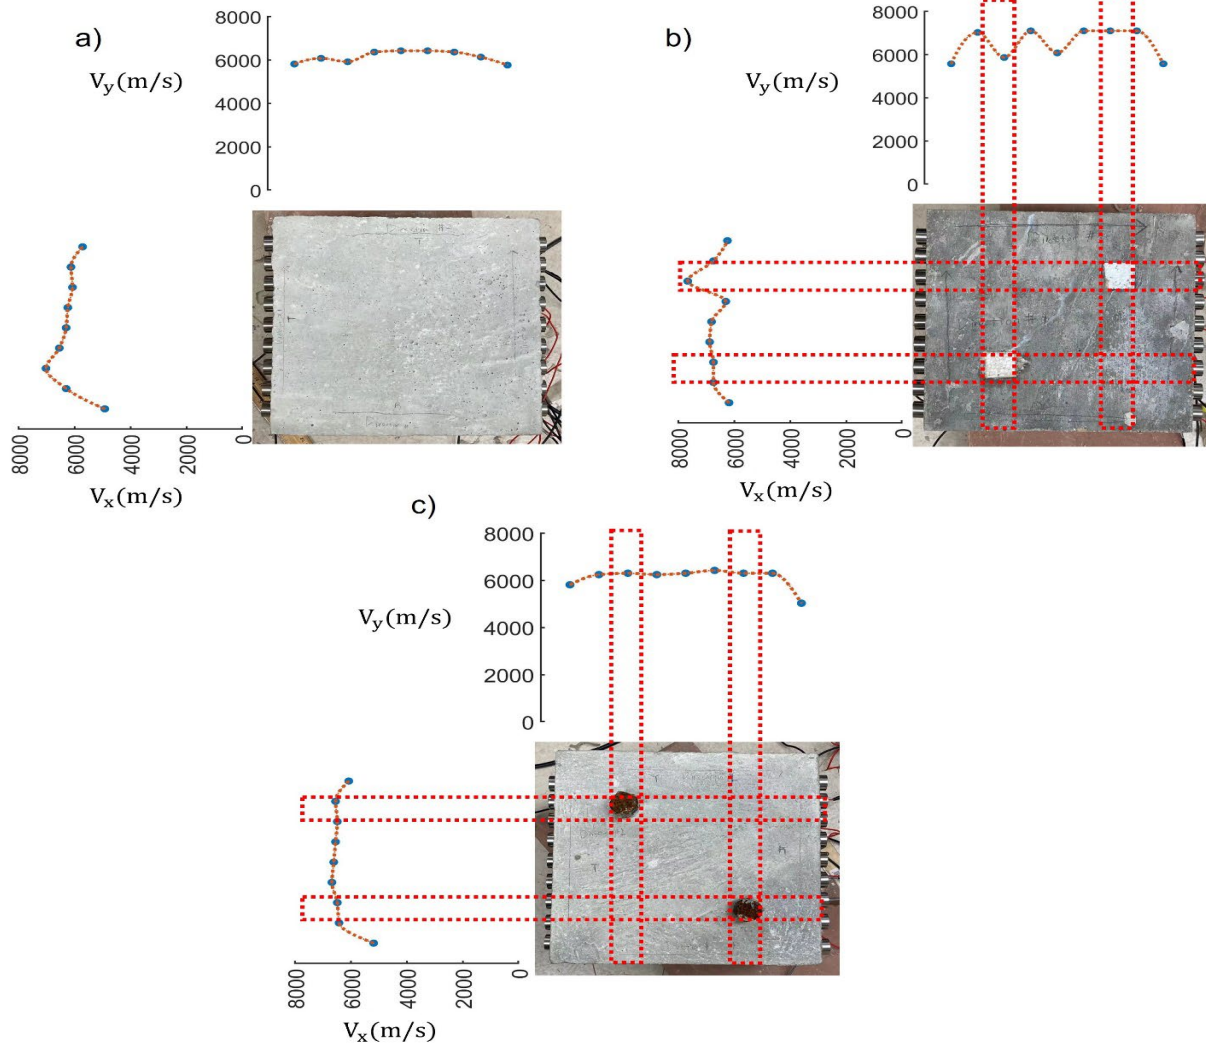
Plane views of three samples: (a) pure concrete sample without inclusions; (b) concrete with #7 reinforcements; and (c) EPS foamed concrete sample.
